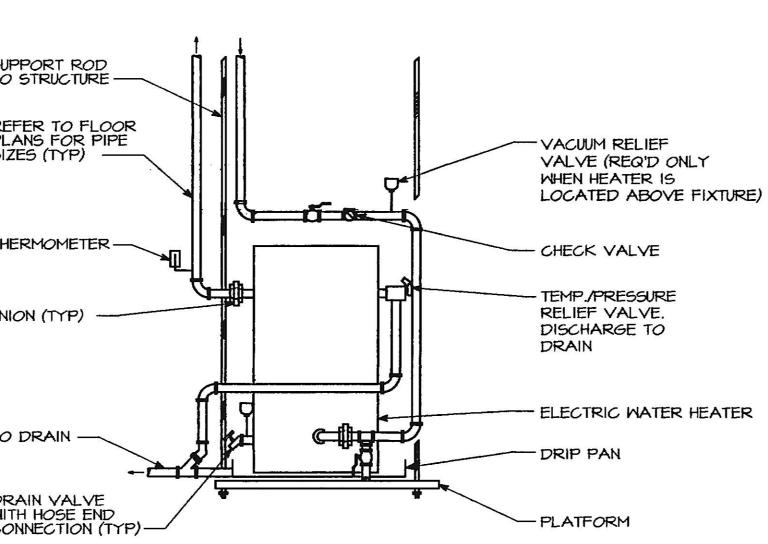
DETAIL - ELECTRIC WATER HEATER PIPING SCHEMATIC (CEILING MOUNTED) NO SCALE
